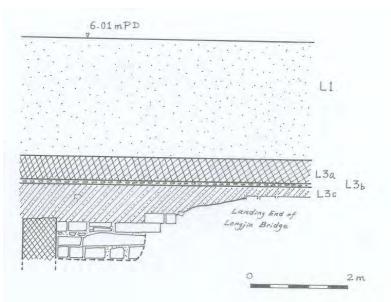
Eastern Section of Wall Foundation Stones of Pavilion for Greeting Officials
